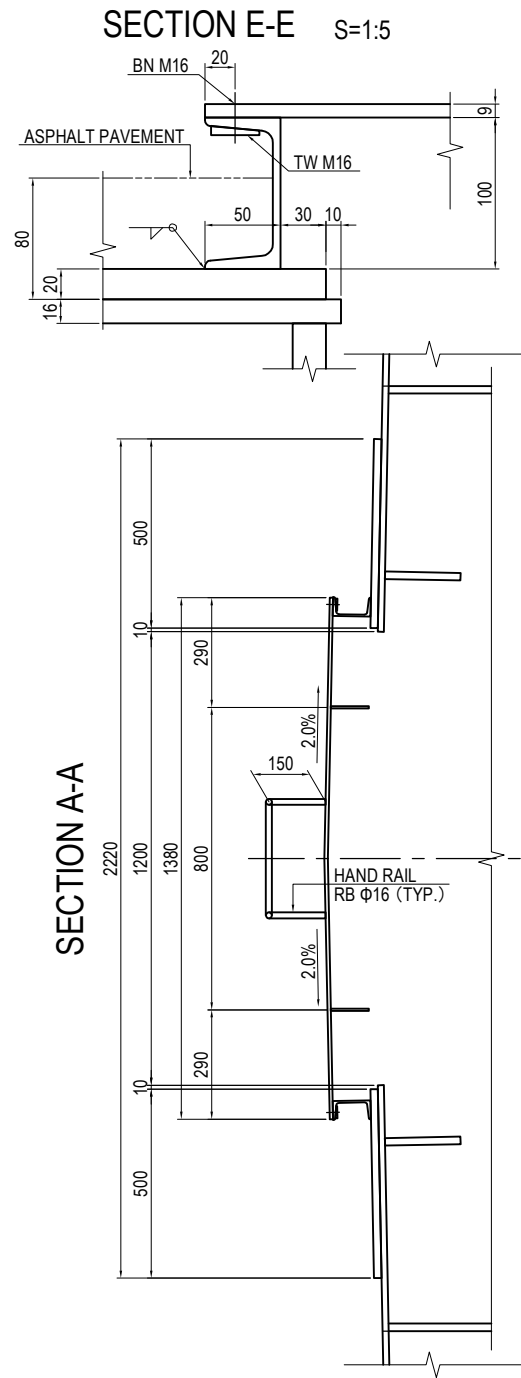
DETAIL OF MAIN GIRDER STANDARD (9) S=1:20
